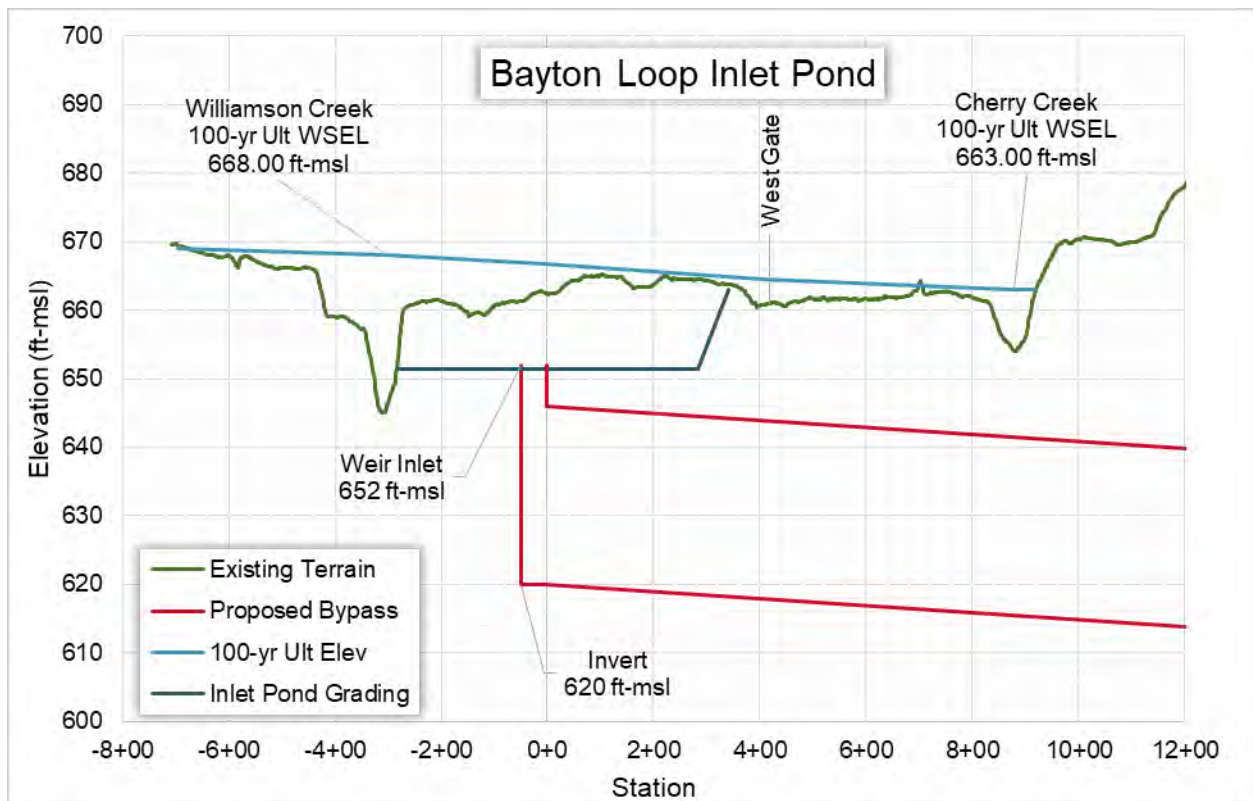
Alternative H – Bayton Loop Inlet Pond Profile
